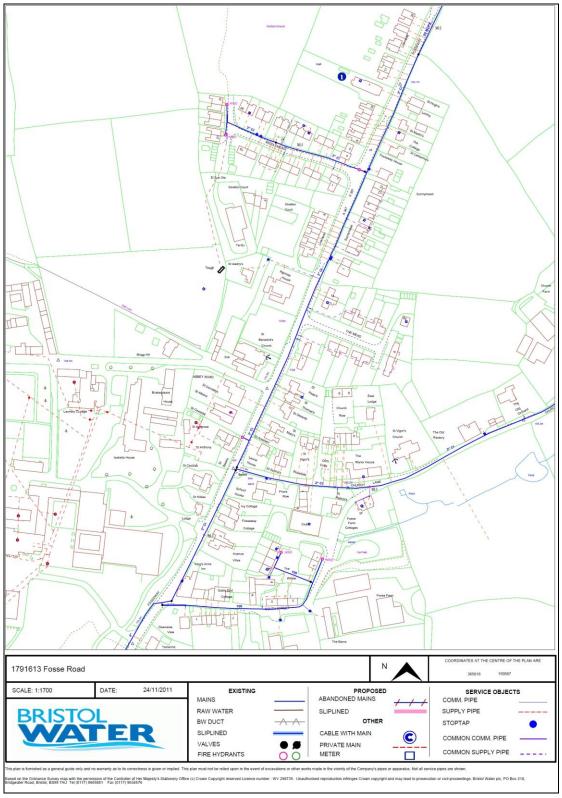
Bristol Water scheme plan (Scale 1:1700) showing location of proposed mains refurbishment works at Stratton on the Fosse
